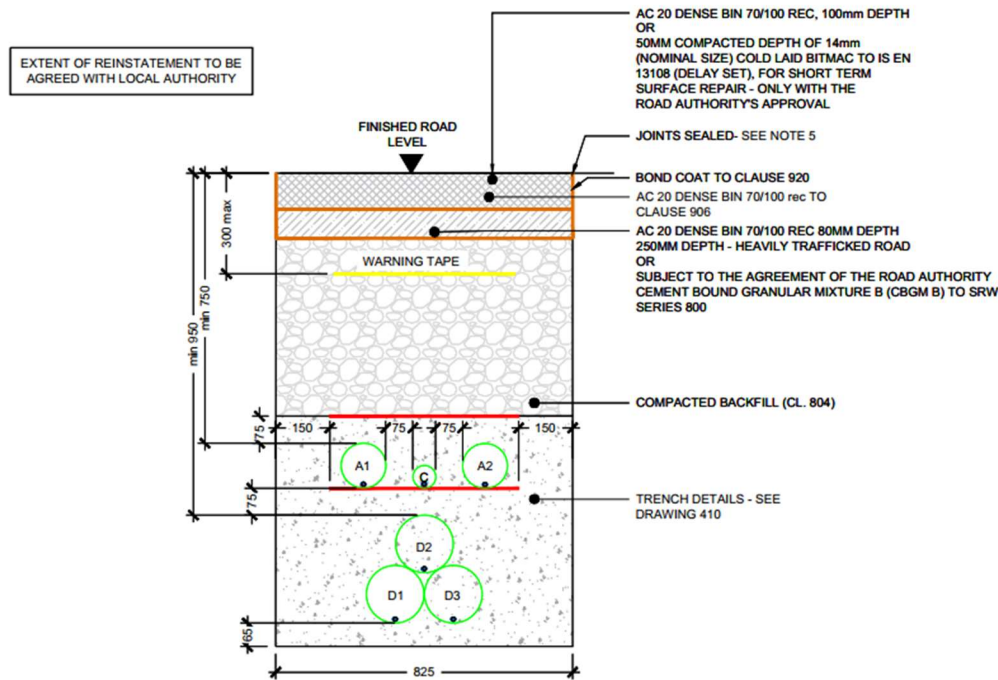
Typical Temporary Reinstatement of Longitudinal Opening in Roadway
